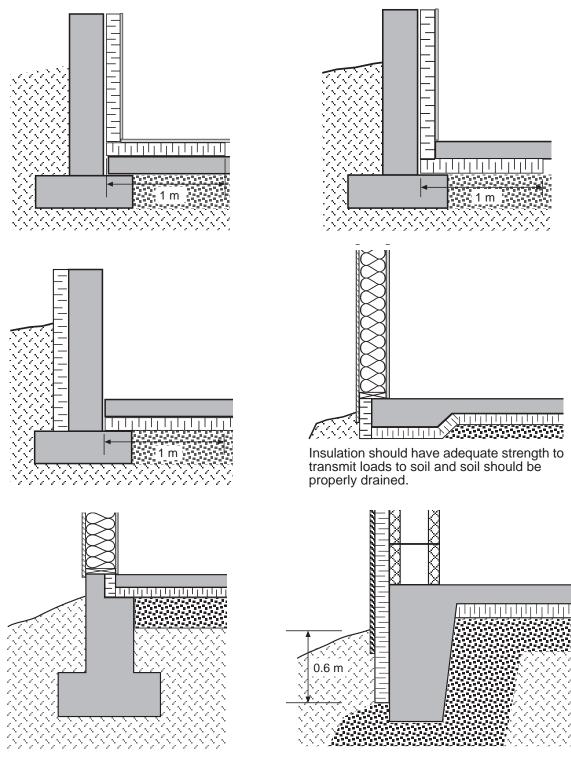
Insulation on Perimeter of Slabs on Ground at Walls
